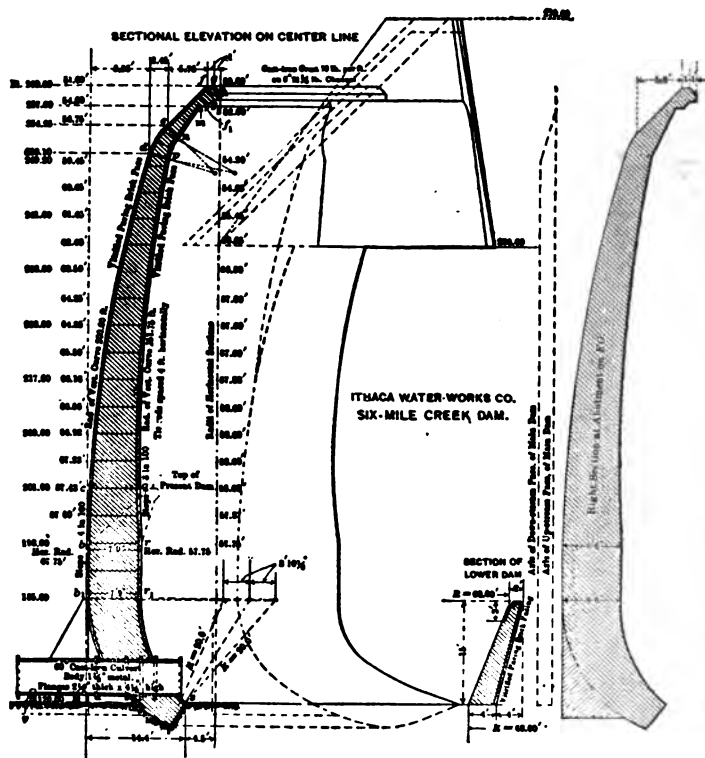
ITHACA CONCRETE-BRICK FACED DAM. SECTIONS OF DAM AS PLANNED.
